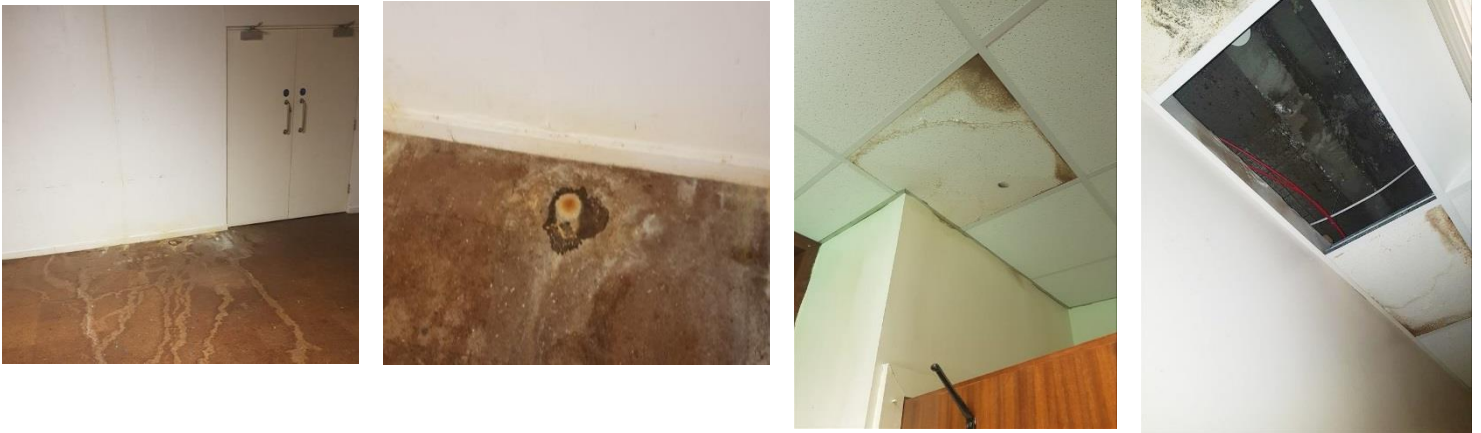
, 7., 8. & 9. Views of the objects store, racking, ductwork, wall and pipework.
